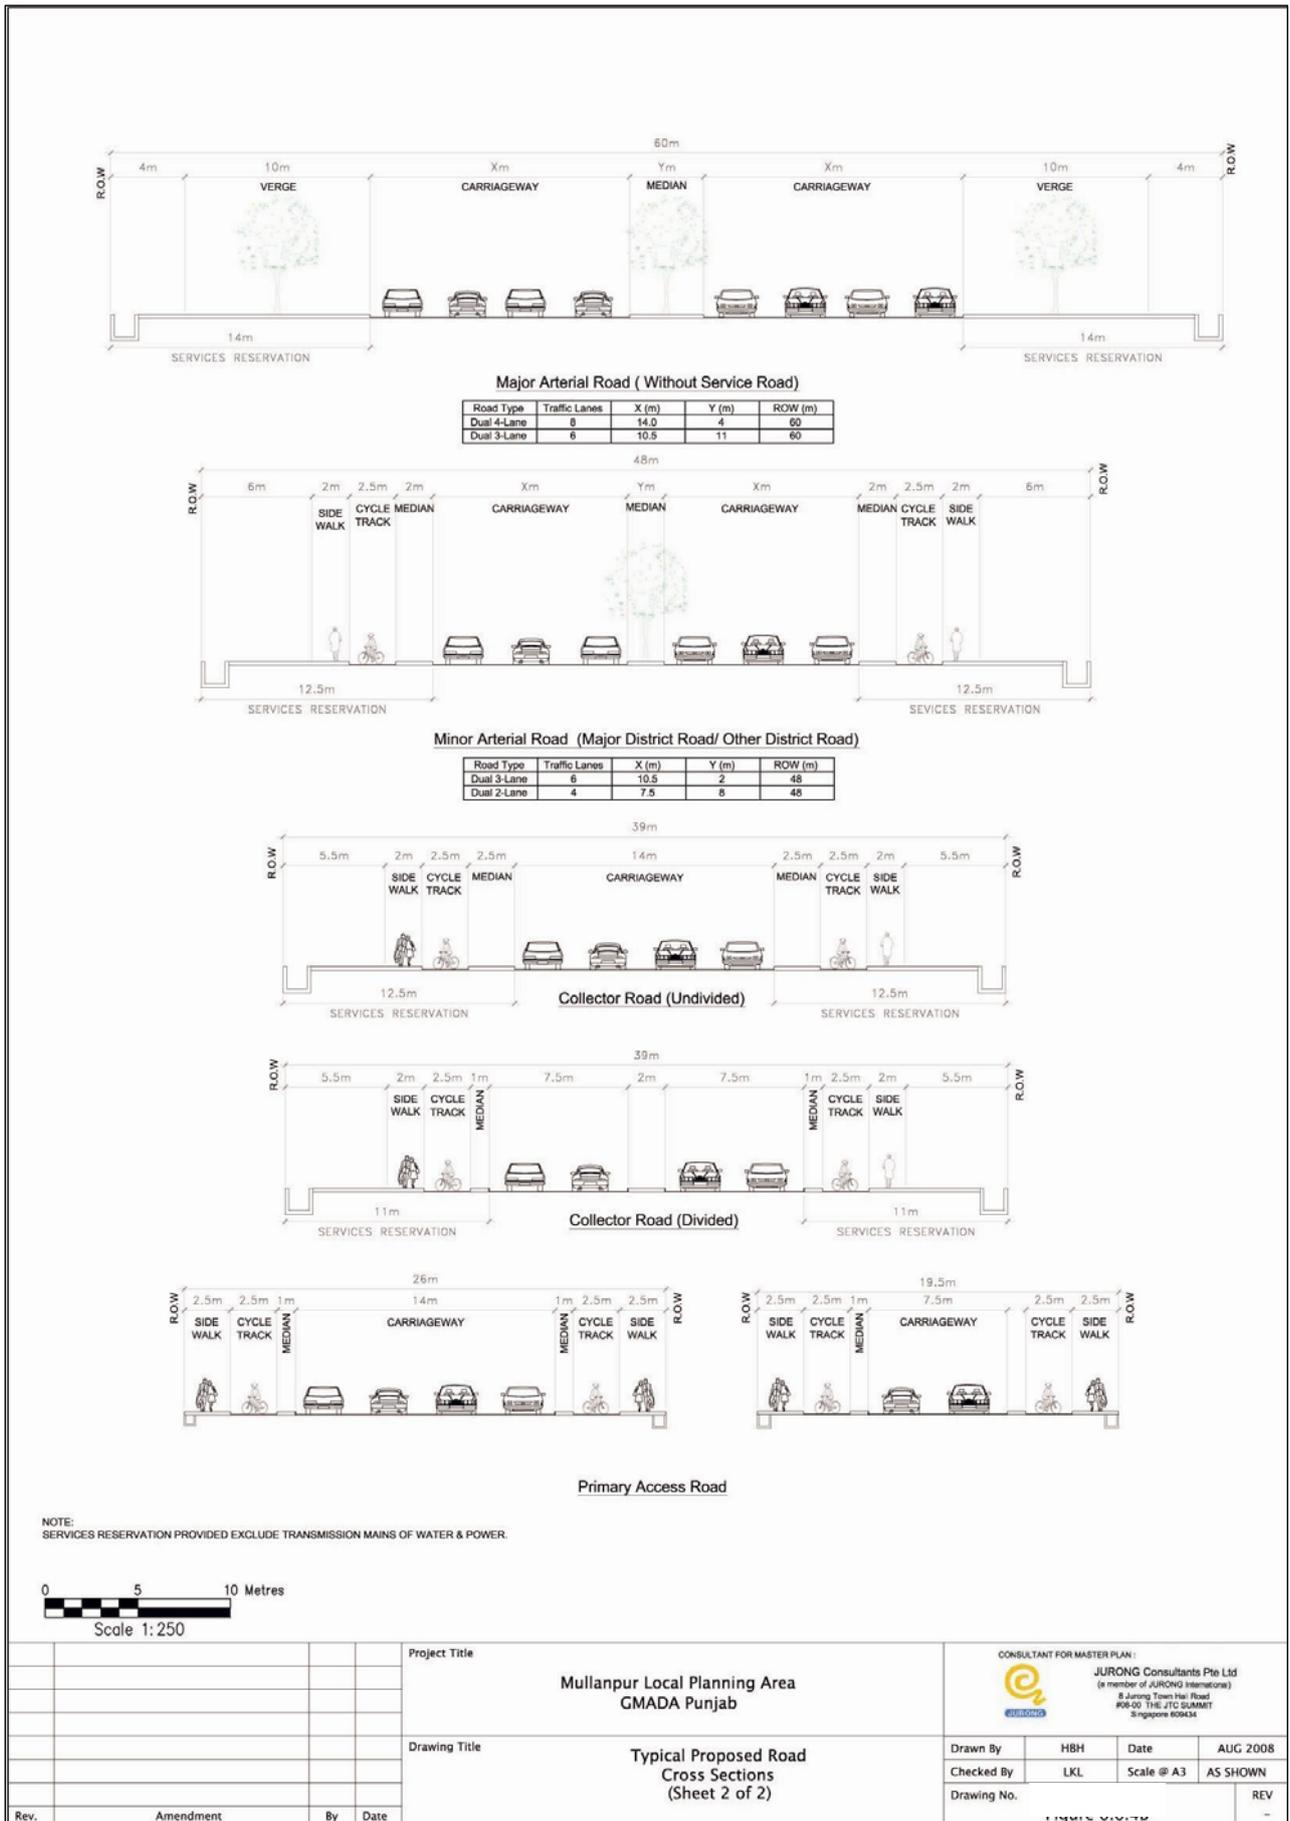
The typical road cross sections of the various hierarchies of roads
